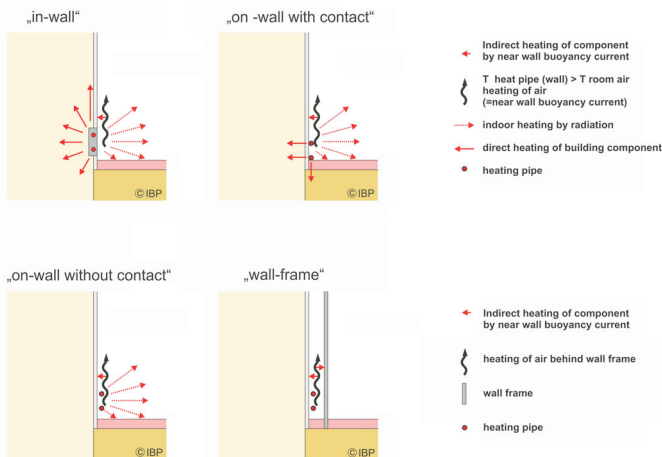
Different build in situations of Temperierung systems: in-wall heat pipe, heat pipe in front of the wall with and without wall contact and heat pipe behind an additional frame. The effects of each Temperierung system are very simplified shown
